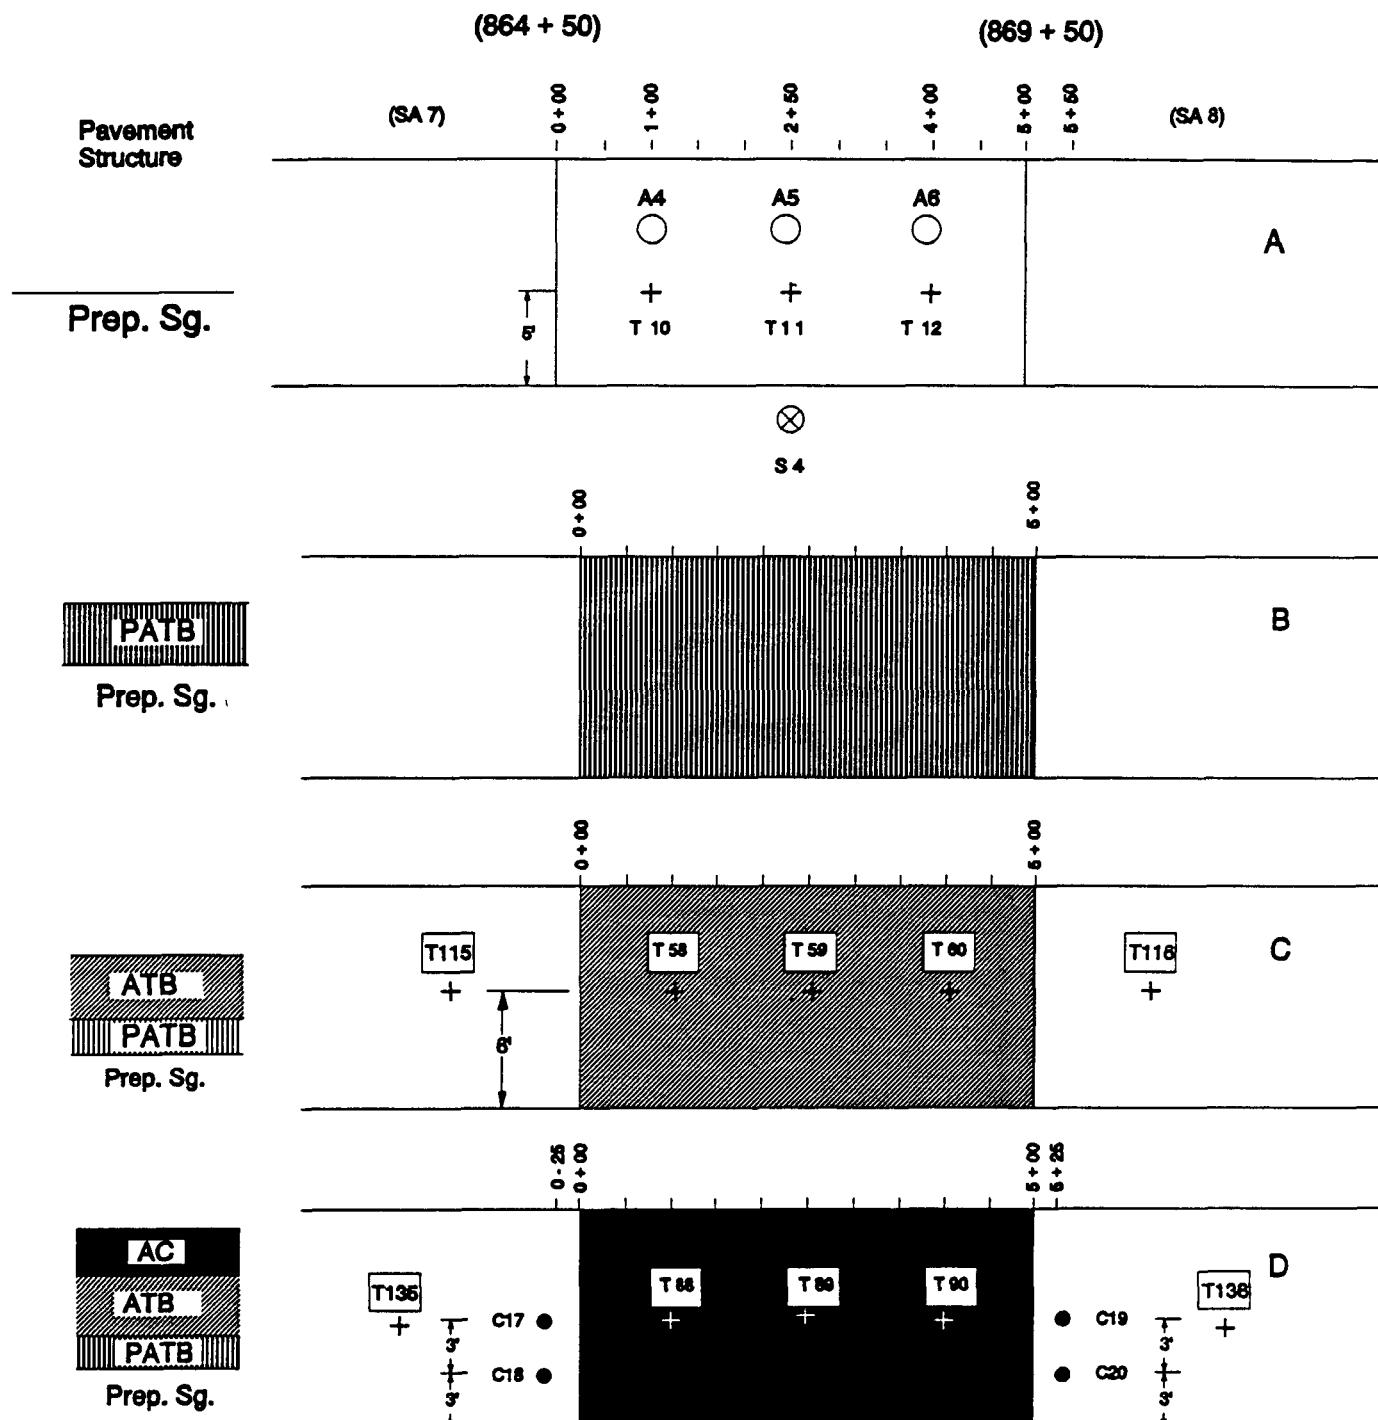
SAMPLING AND TESTING PLAN FOR TEST SECTION 050121
